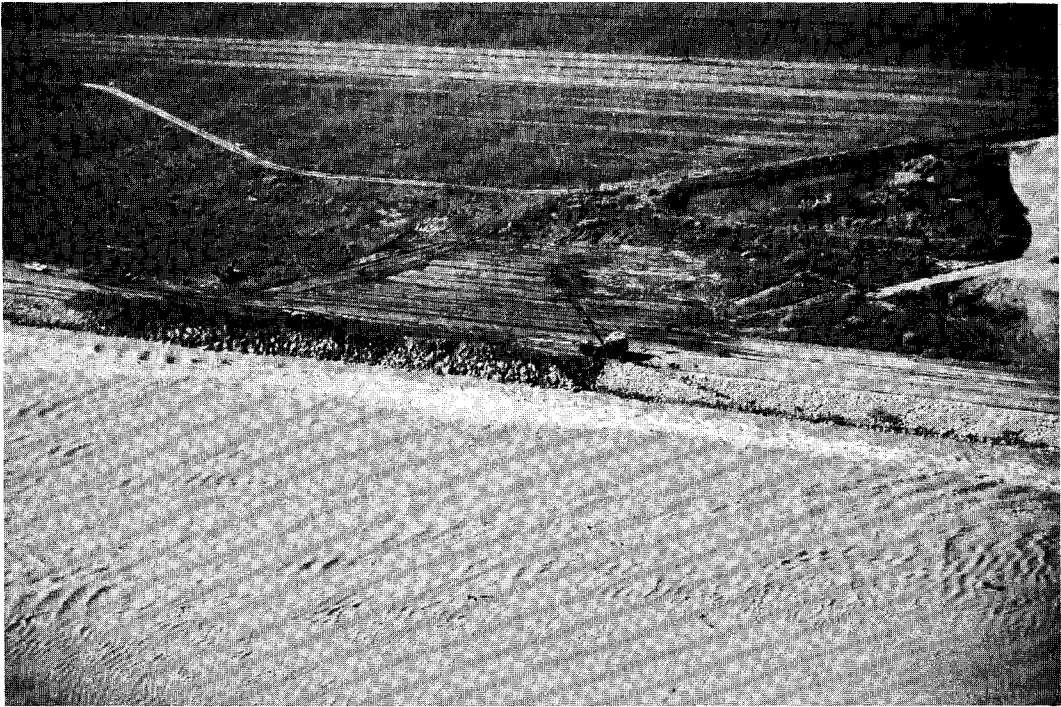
Rock being dumped on face of levee just downstream of Bradley Canyon to prevent breakout and flooding of Santa Maria during 1969 flood.
